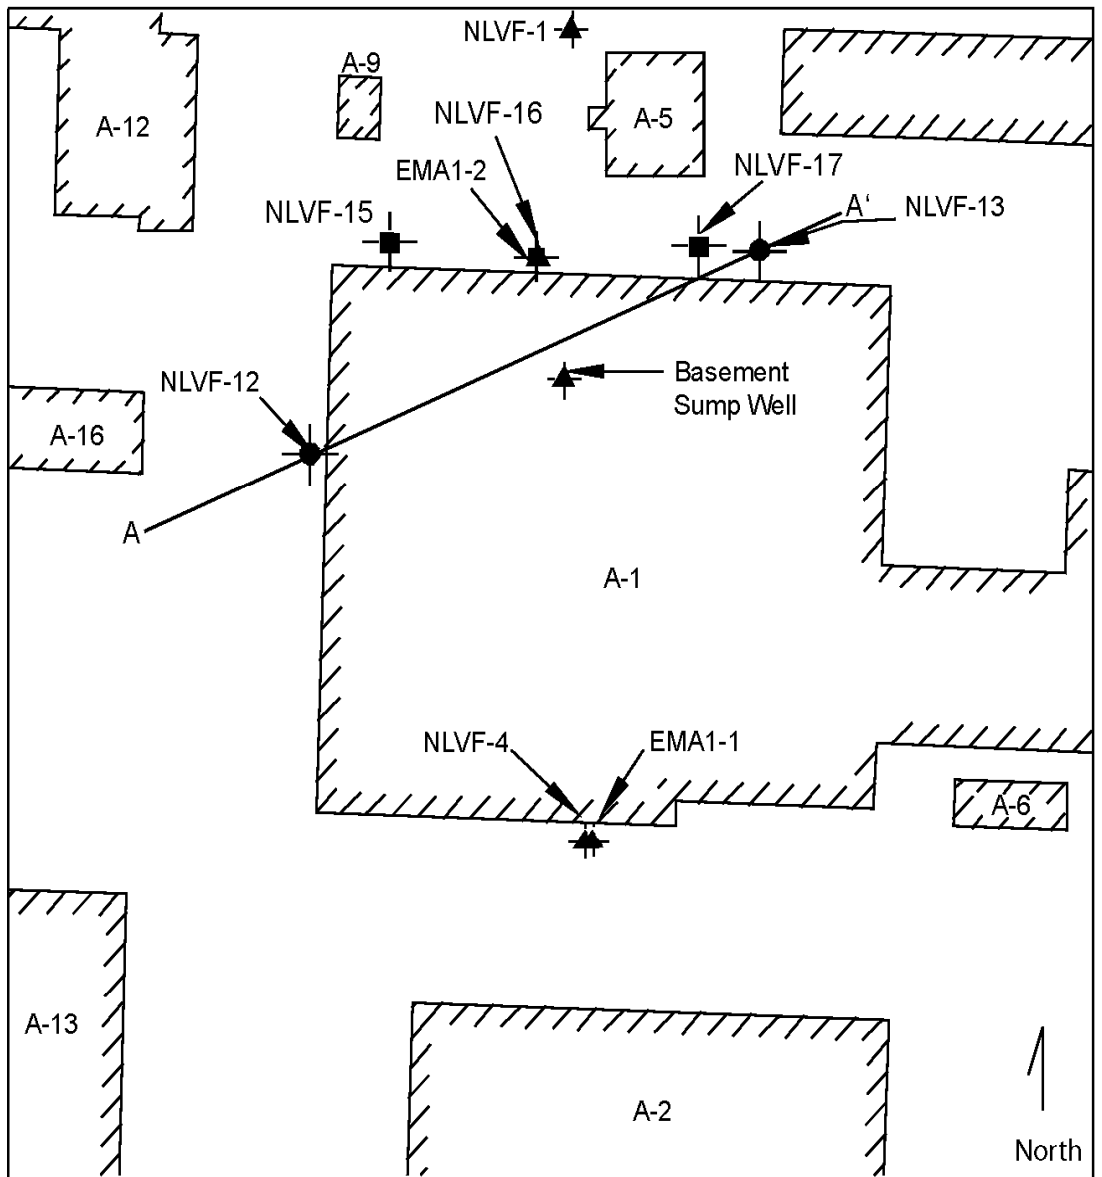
Location of existing and new (2005) dewatering wells around Building A-1
